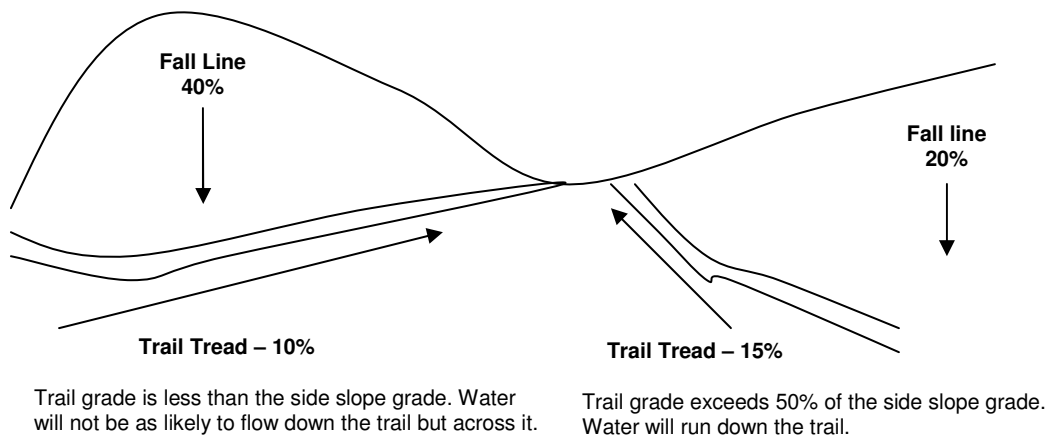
Trail grade recommendations. Source: Building Better Trails-Designing, Constructing and Maintaining Outstanding Trails, International Mountain Bike
